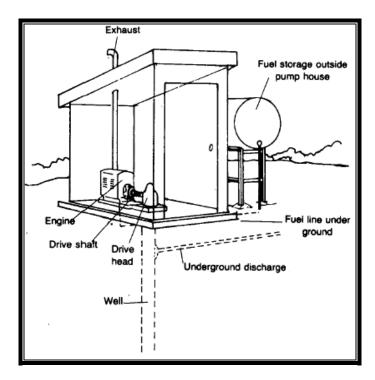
20 Pump House for Internal Combustion Engine and Line Shaft Vertical Turbine Pump
